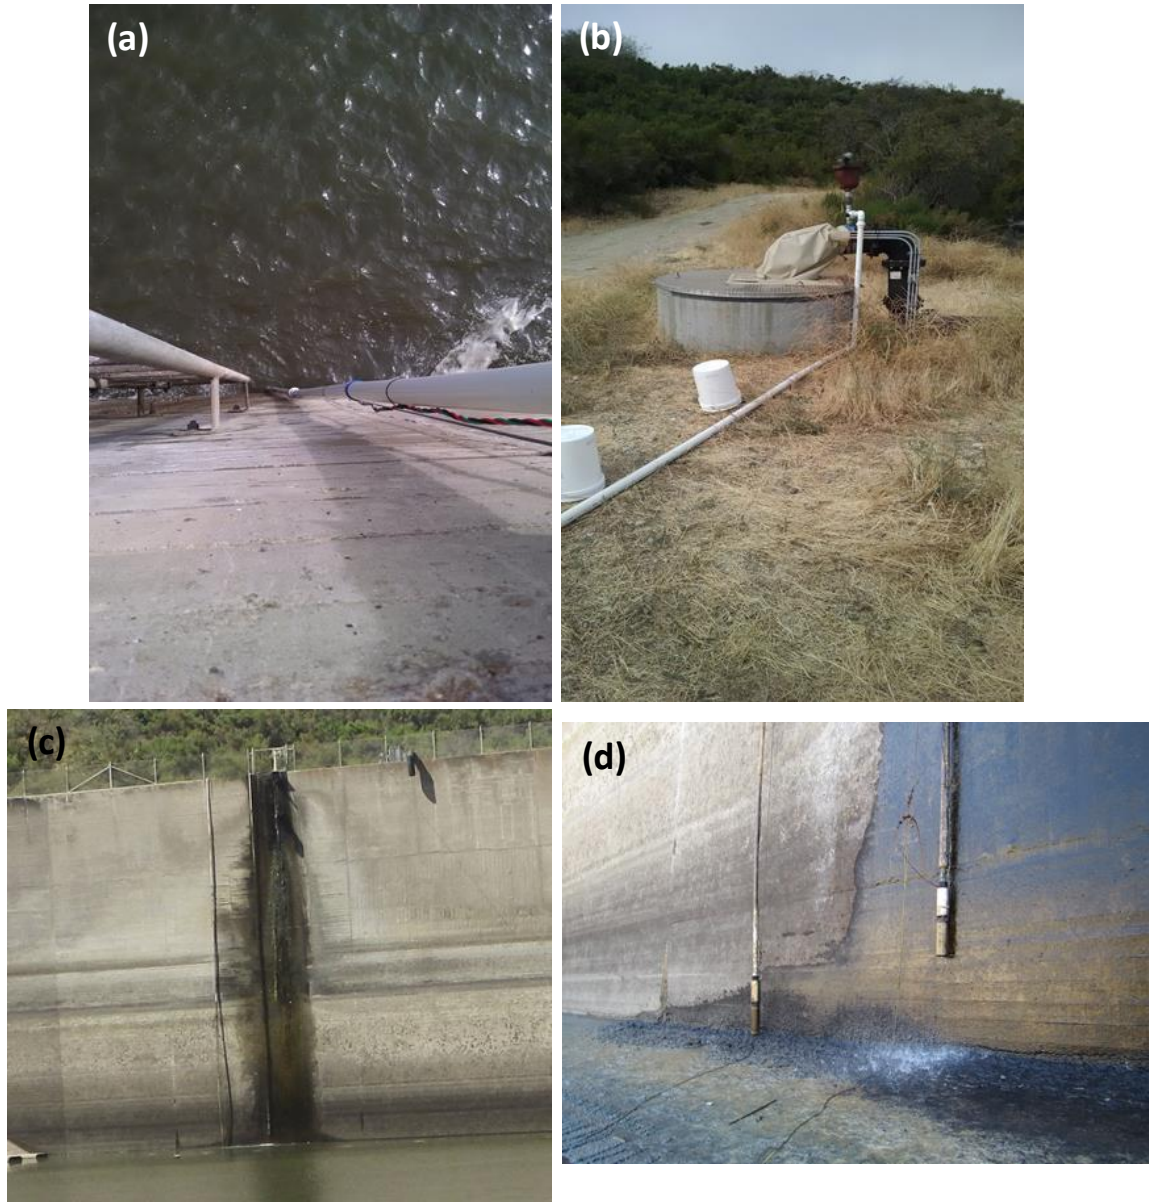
Stilling Basin (well) pumps (operational and backup) that provided trickle flow (0.03 cfs): (a) hanging off of the south parapet wall of the spillway, (b) connection of the pumping pipeline to the Chute Release Point, and (c+d) hanging pumps on the parapet wall during Stilling Basin dewatering efforts in WY2017.
